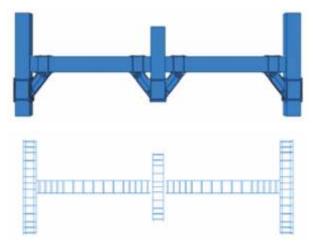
Modeling of Precast Dry Connection and Reinforcement
